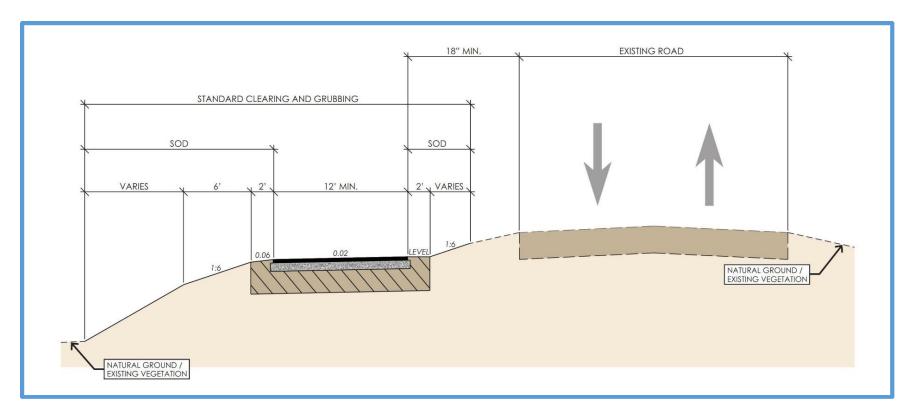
Typical Section, E-W CANA Alternatives 1A and 1B (along North Side of Beach Road)
